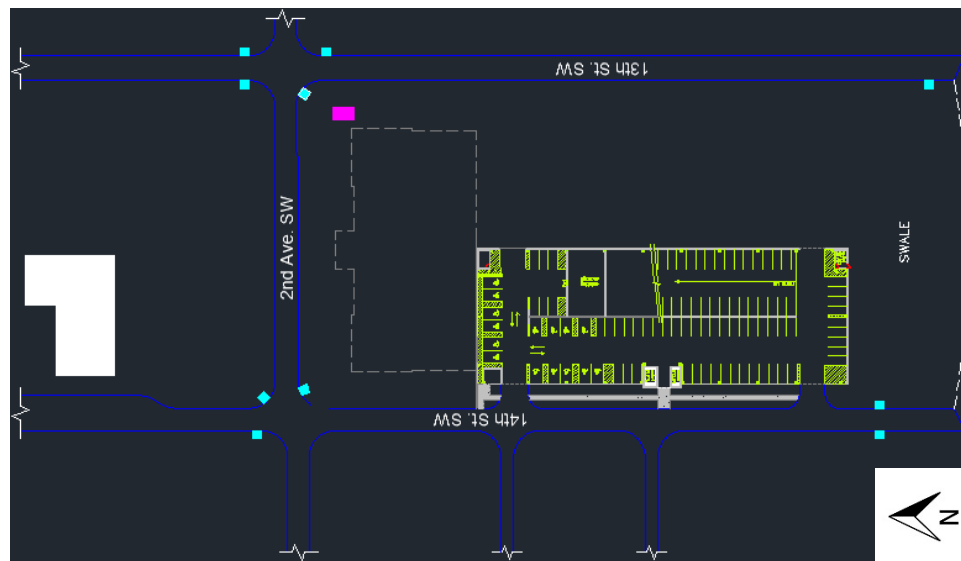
, Locations of Storm Drains (Turquoise) and On-Site Utilities (Magenta)
